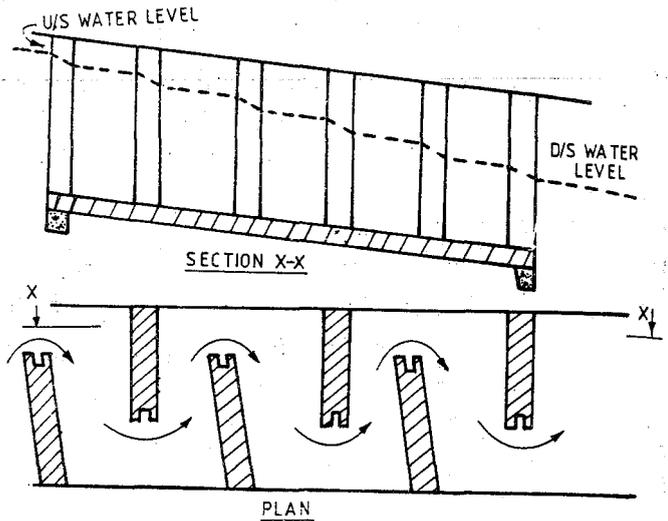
(a) Section and plan of a typical fish ladder.
